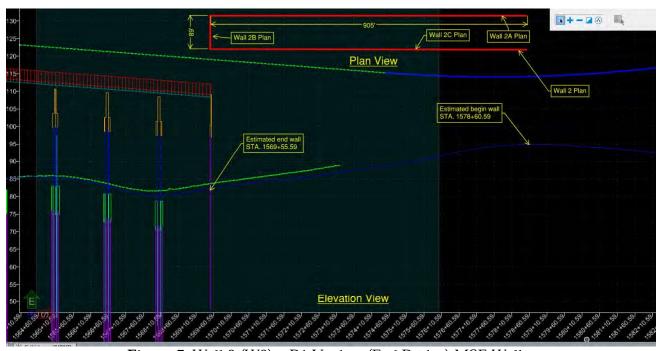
Wall 2 (W2) – B1 Viaduct (End Bridge) MSE Wall
